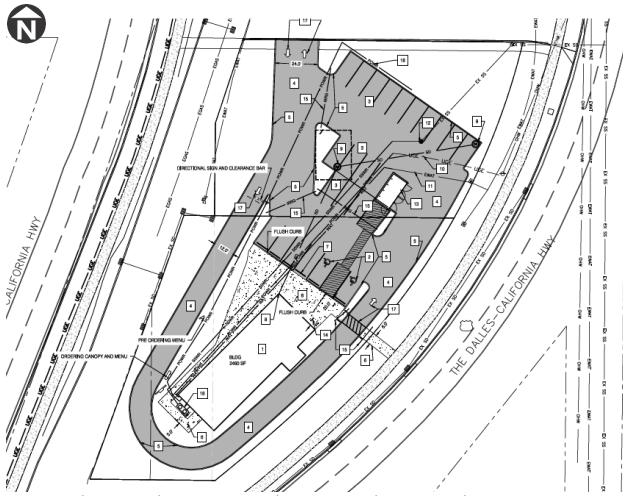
Preliminary site layout. Source: Steele Associates Architects, November 22, 2021.
